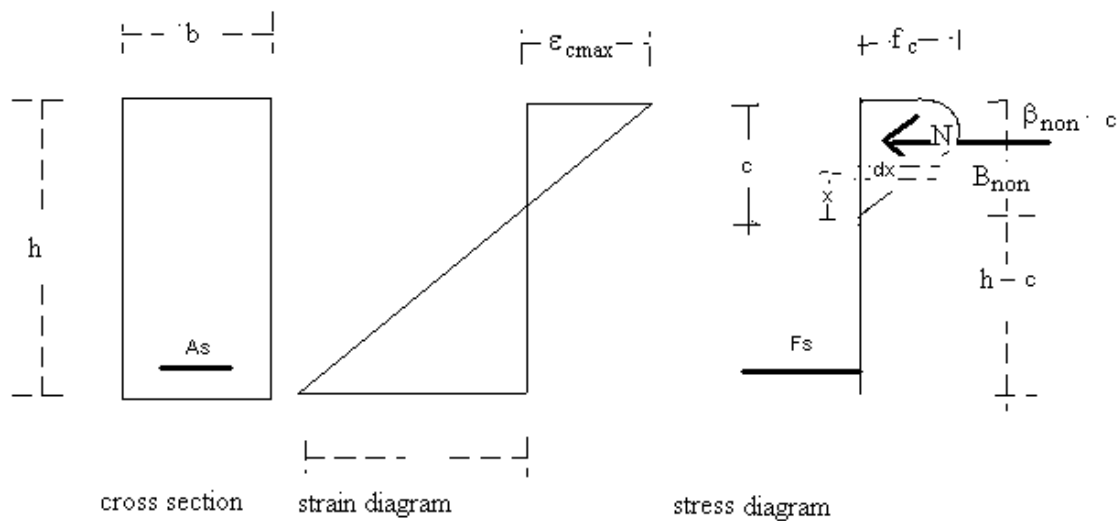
Stress strain diagrams at rectangular reinforced concrete cross-section
